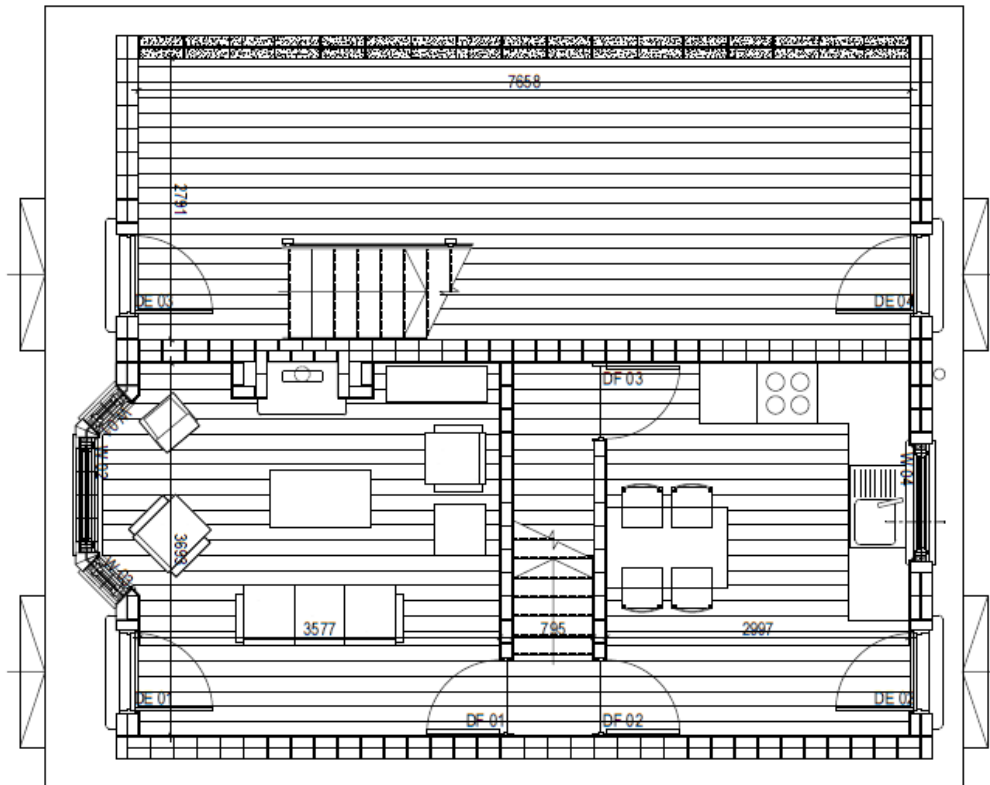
Floor plan for the ground floor of the Energy House.
